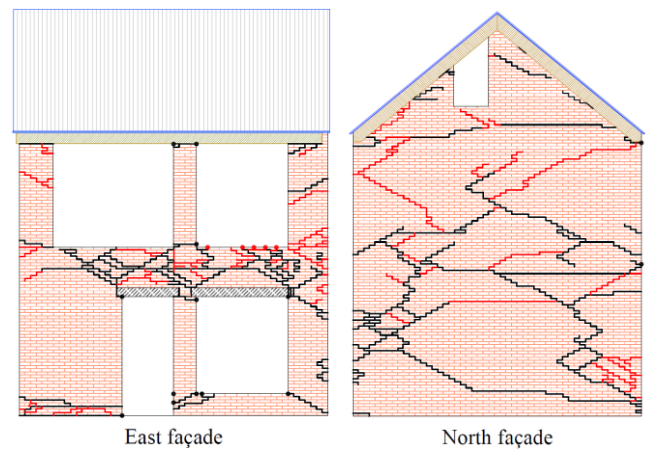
Retrofitted building crack pattern at ultimate conditions: clay outer leaves.
